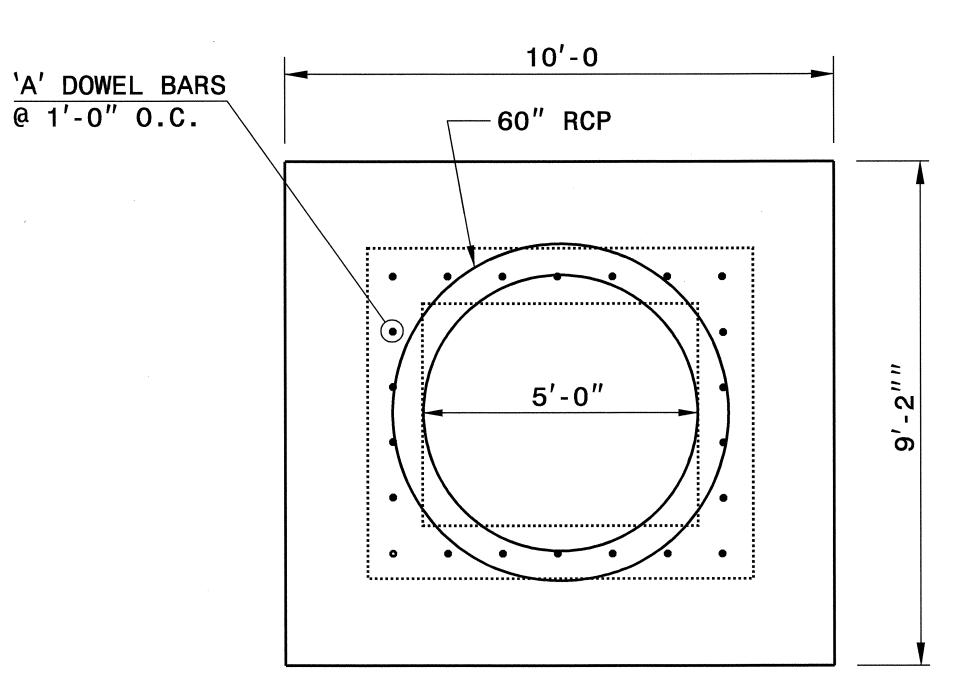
DETAIL OF COLLAR CONNECTING EXISTING RCBC TO 60" RCP
